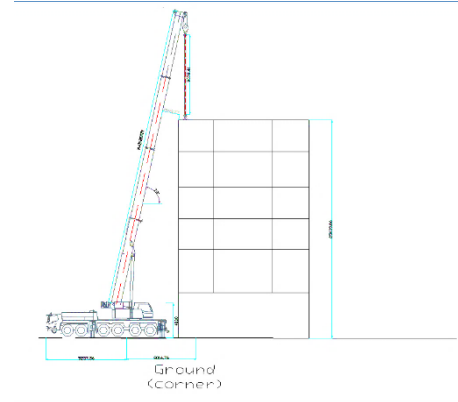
View of the crane in the lifting position of Plan No. 1 to pick up the concrete piece closest to the silo.
